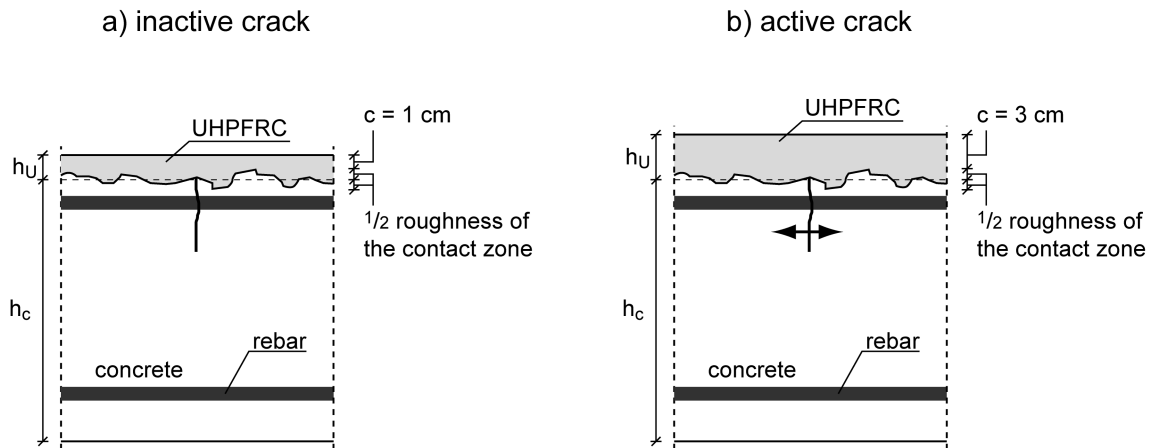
Recommendation for configuration P in case of a) no existing cracks or existing inactive cracks, b) existing active cracks in the concrete layer
